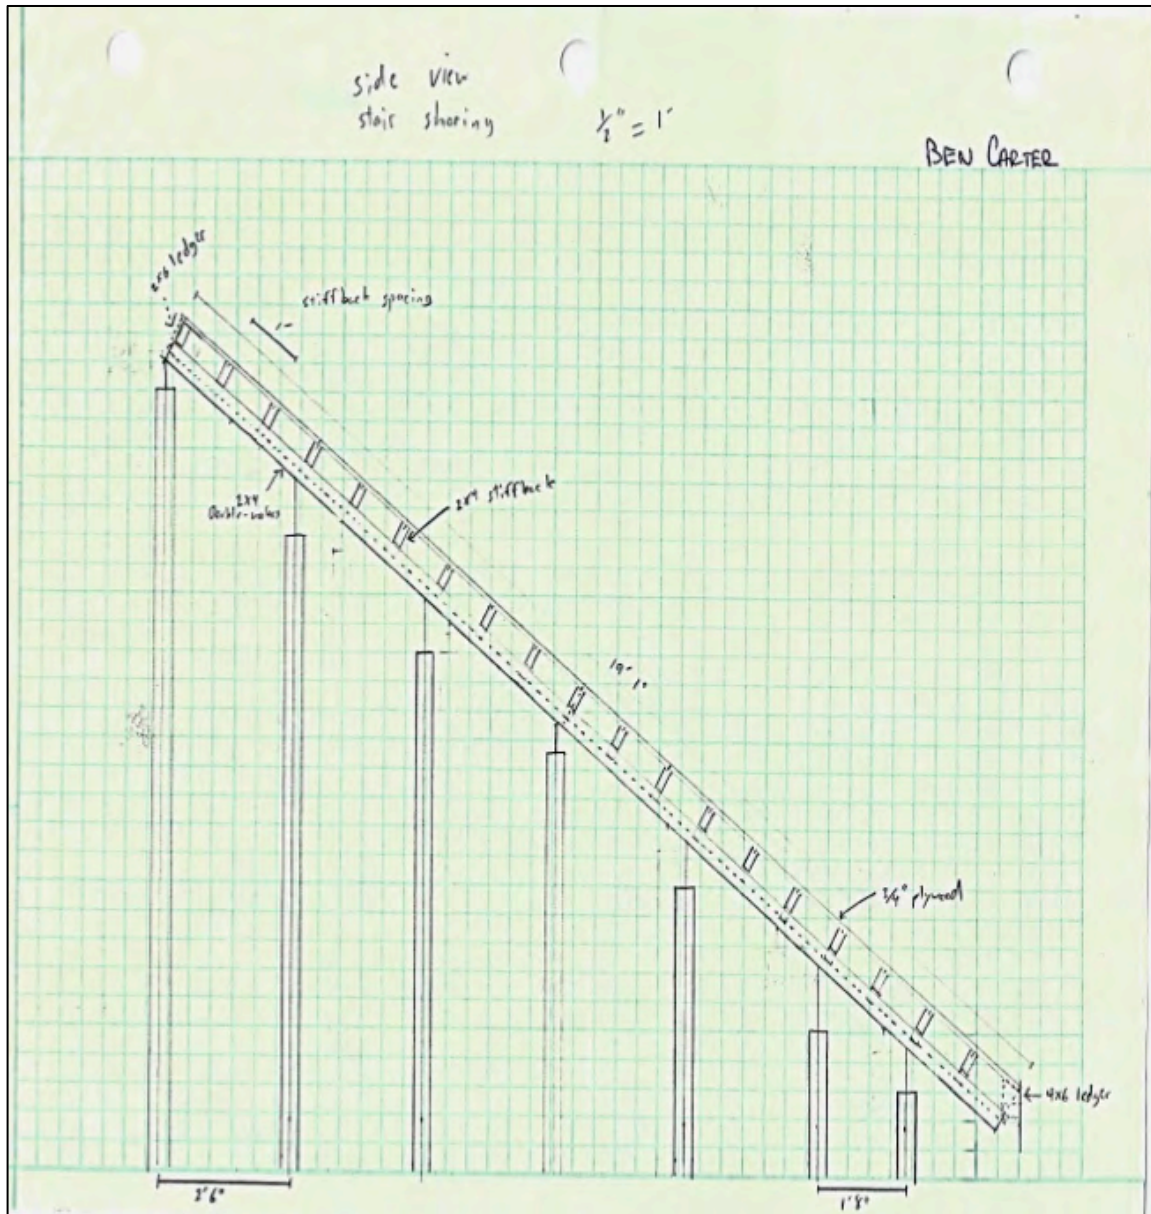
Stair soffit stiff back and whaler positioning diagram.
